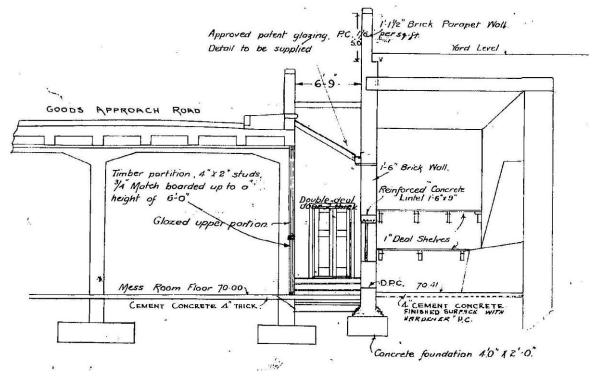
1930s alterations showing a cross section of Vault 5 to the right
